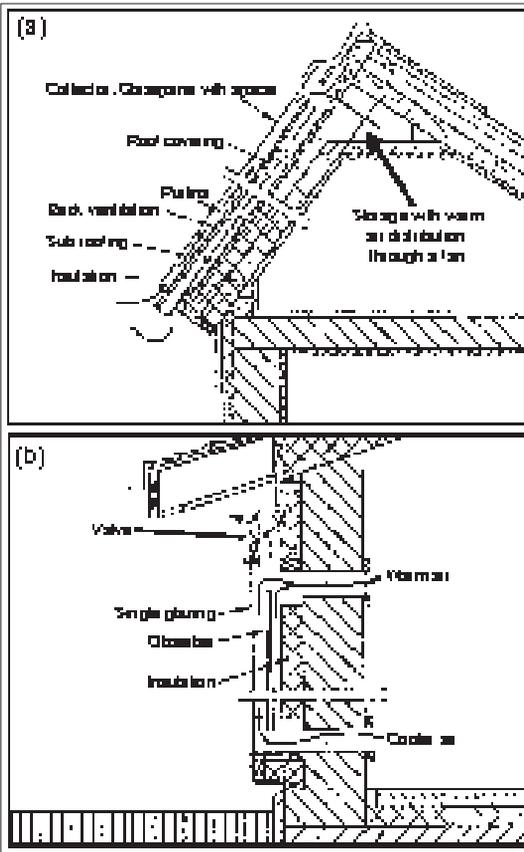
a) Thermosiphon Air Panel Installed on the Roof
